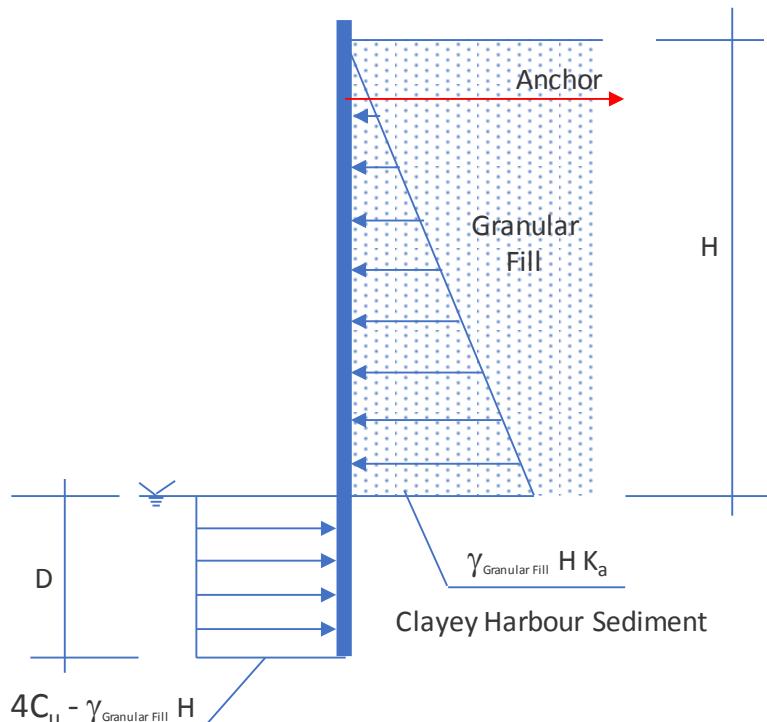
Schematic lateral pressure distribution on anchored sheet pile wall in clay
